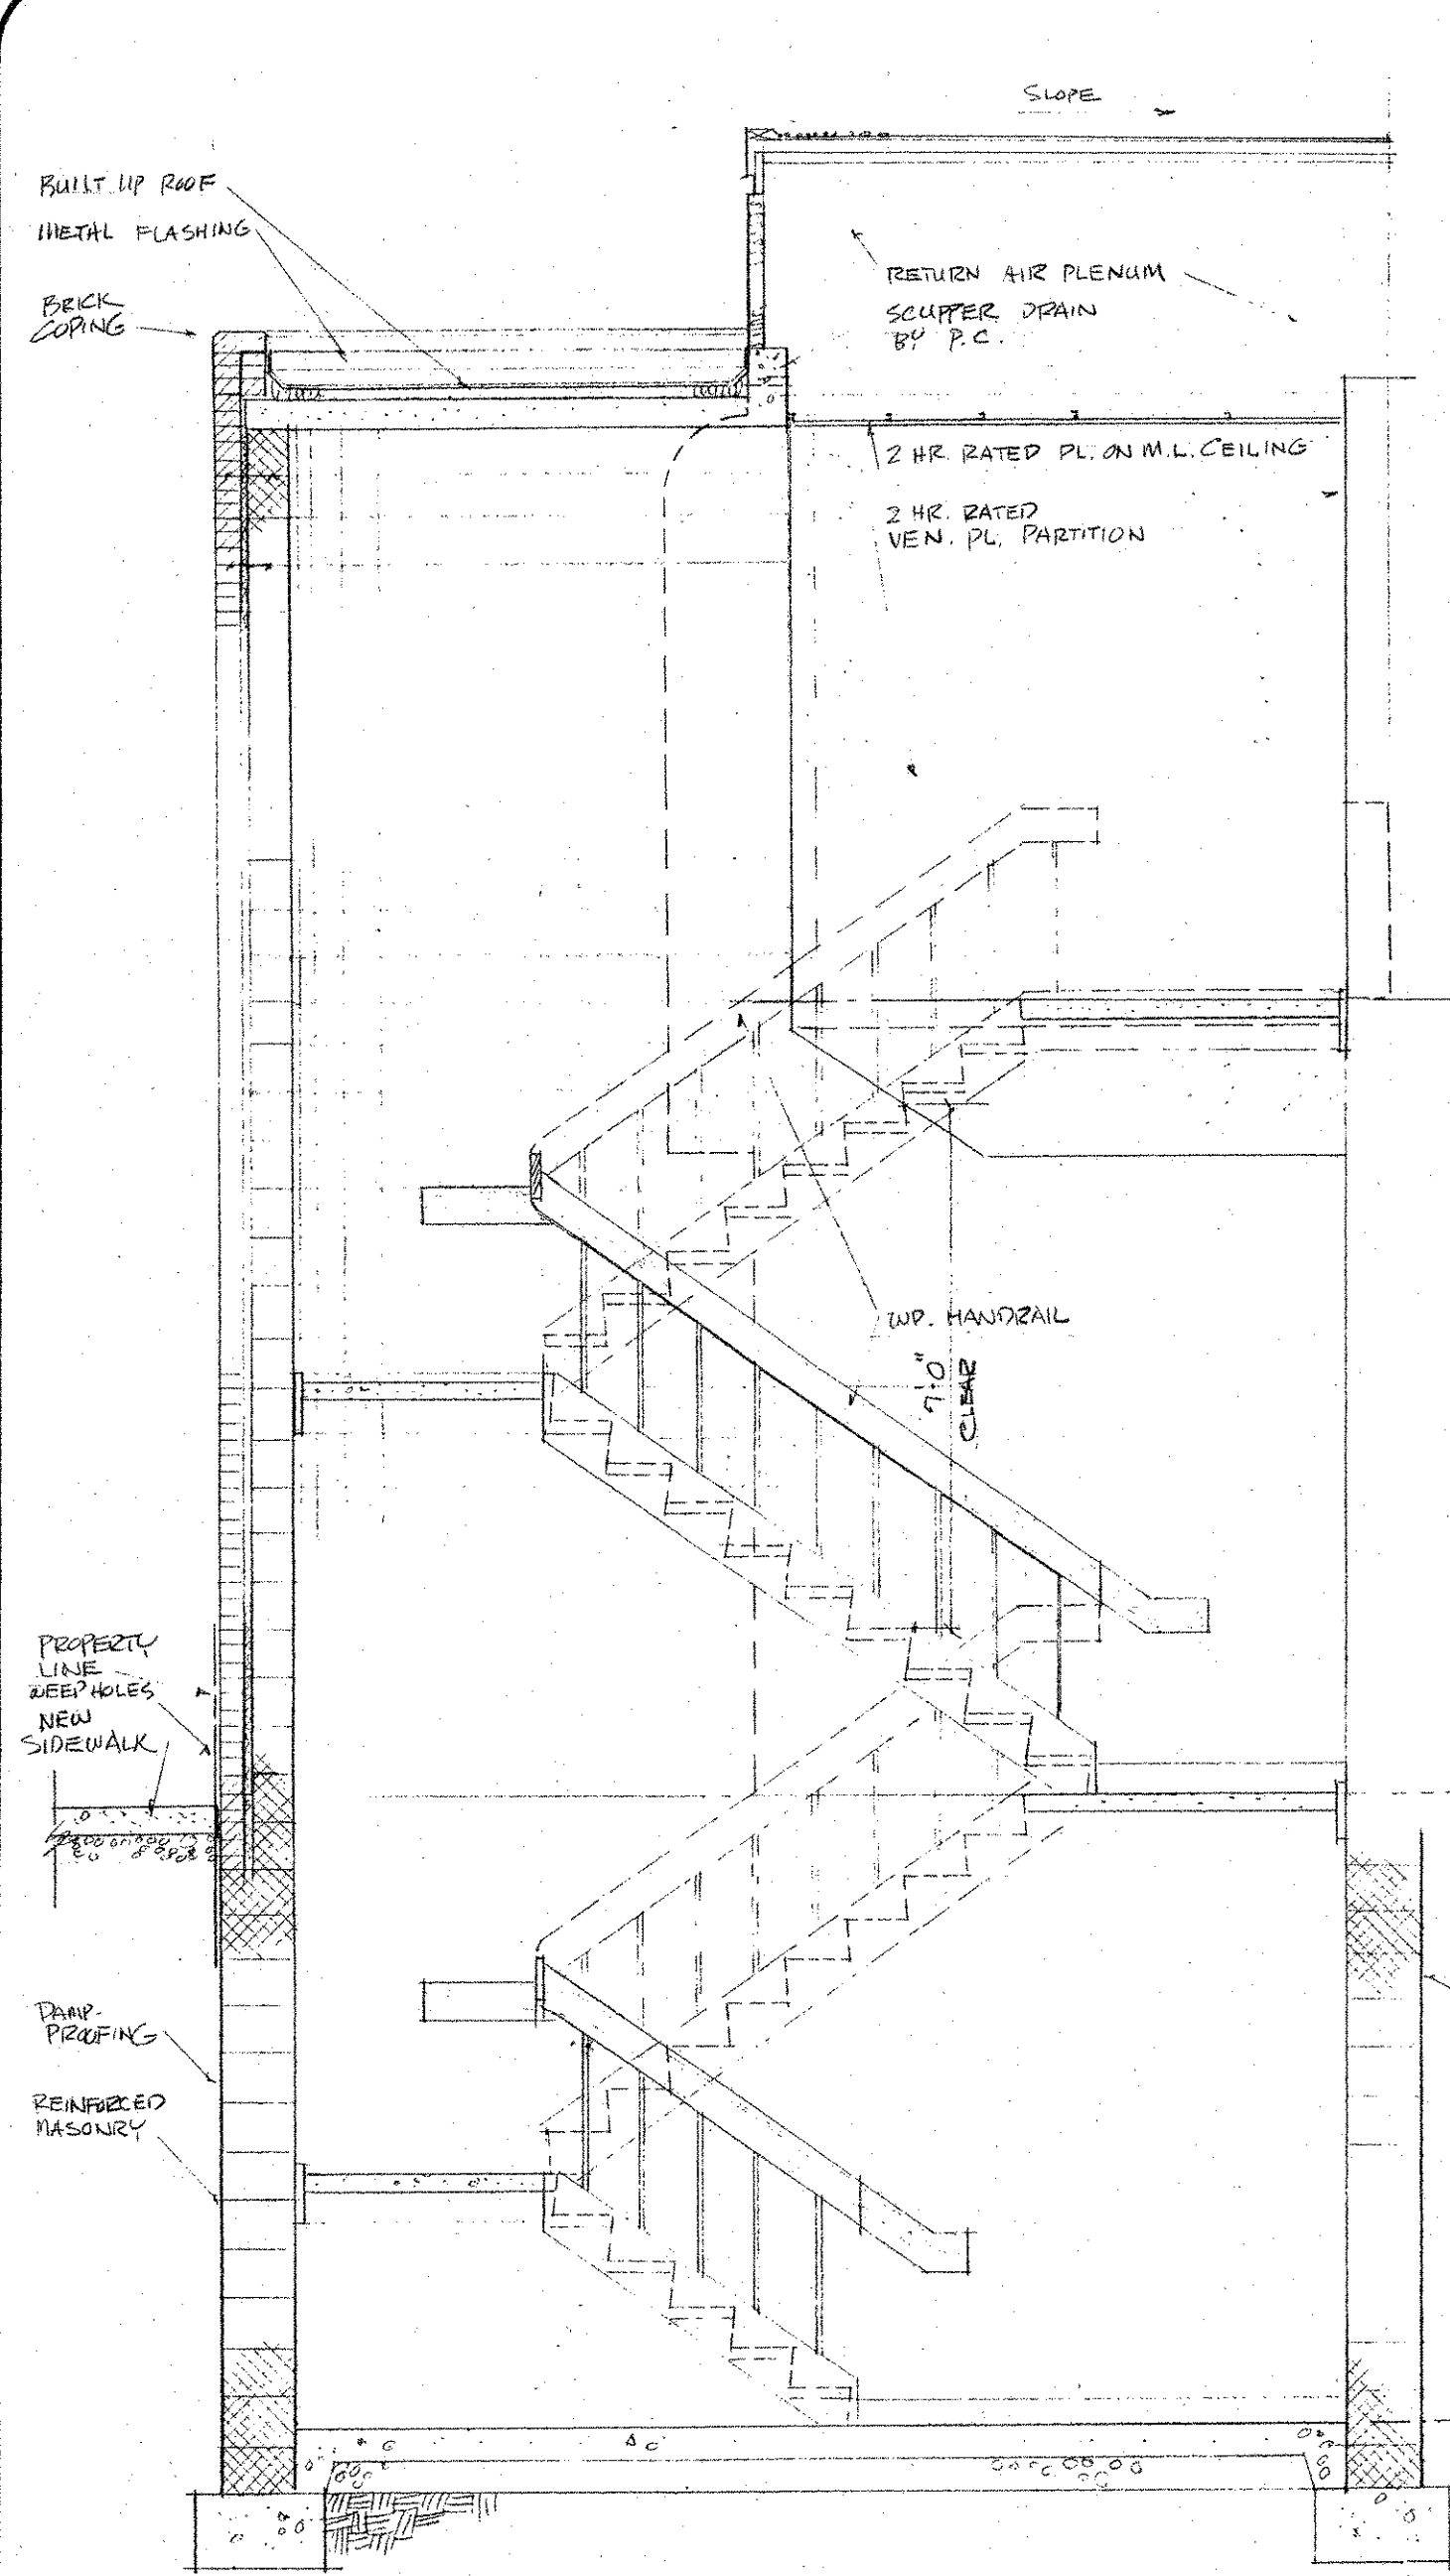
DETAIL OF STAIR #2 AND 3 AND SERVICE CORE DETAILS		REVISIONS
